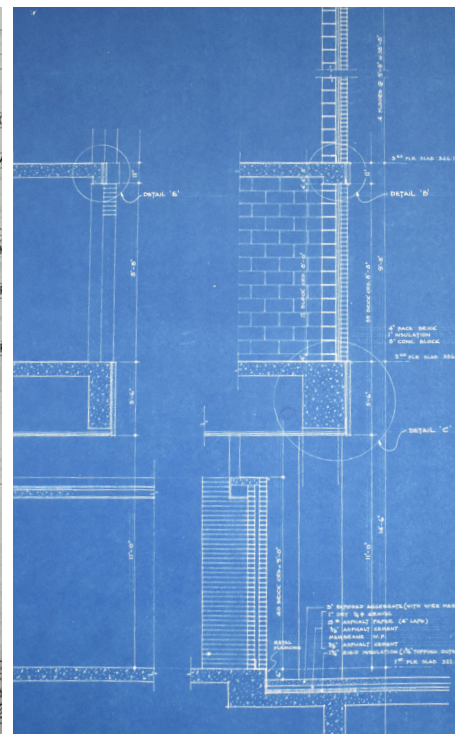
Envelope details for Buildings C & K (T. V. Murray, 1963).
